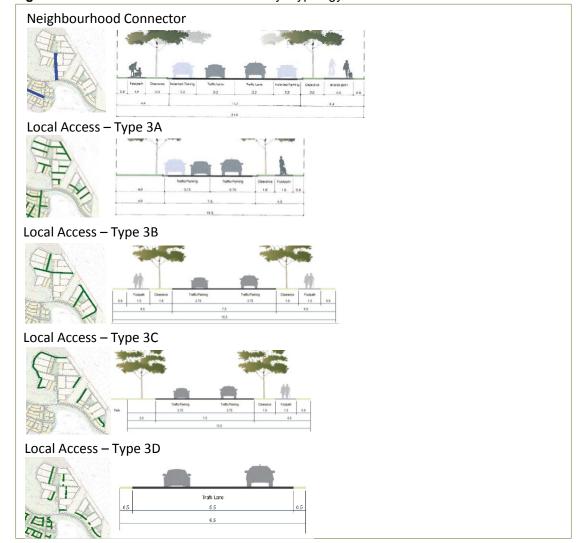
Extract of Internal Road Hierarchy / typology and cross section
